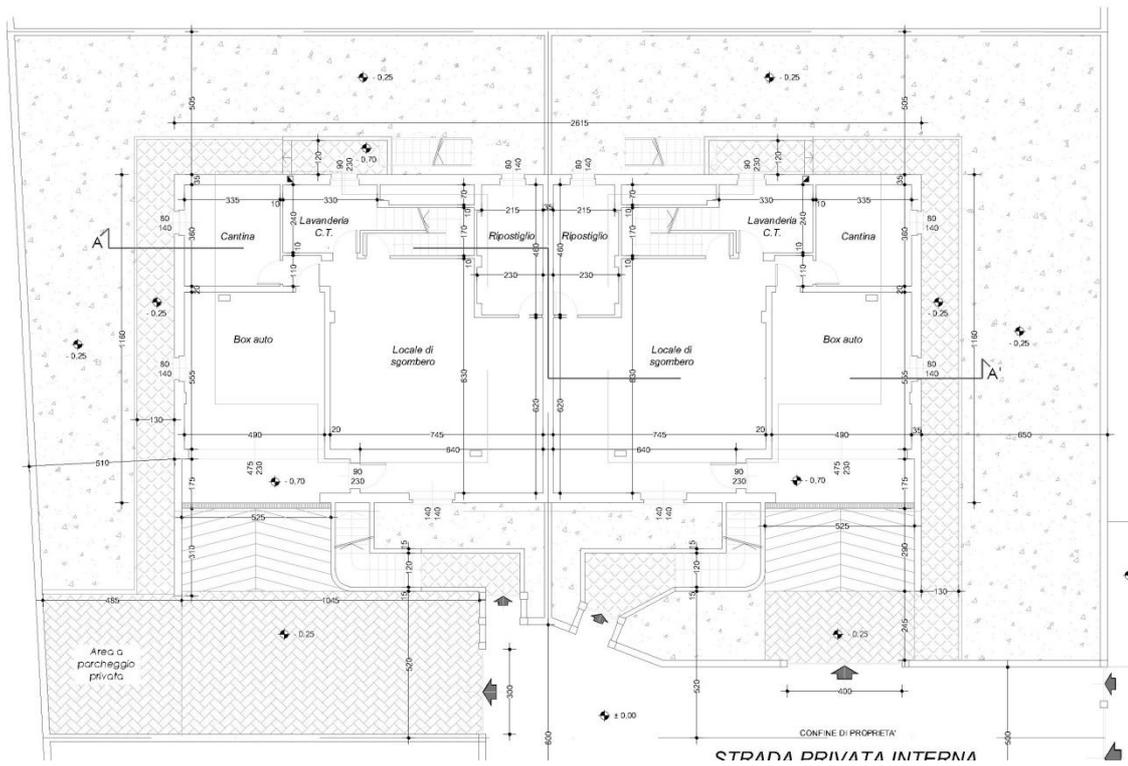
Basement Floor Plan (Via Melhab 1)
